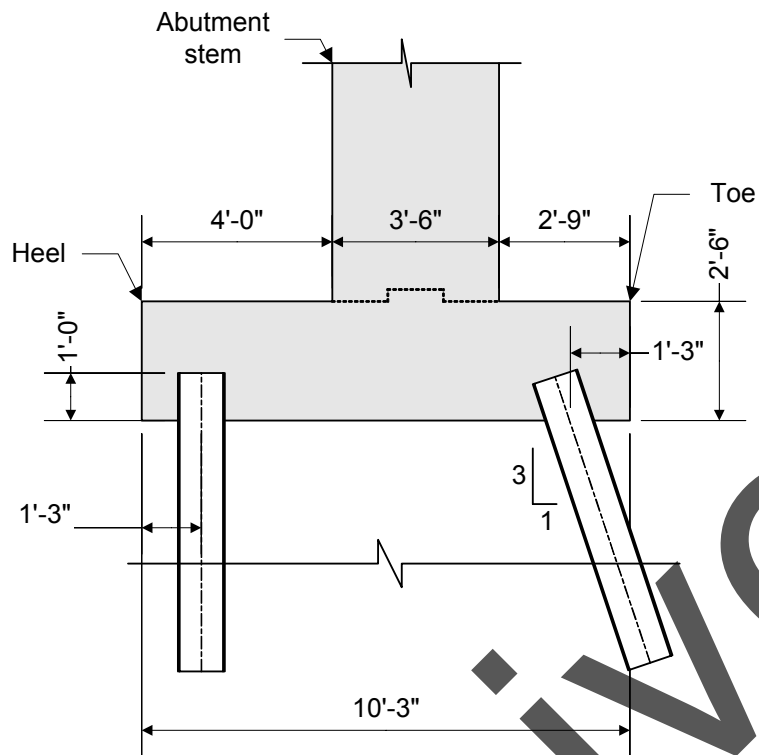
Abutment Footing and Pile Foundation Plan View
